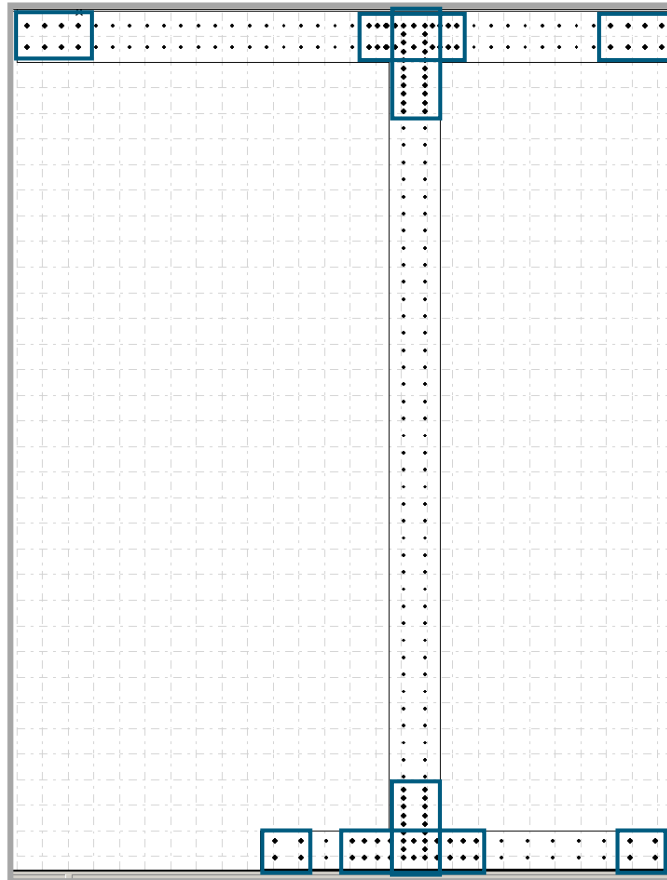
Vertical Reinforcement Layout for Strength Check of Shear Wall
